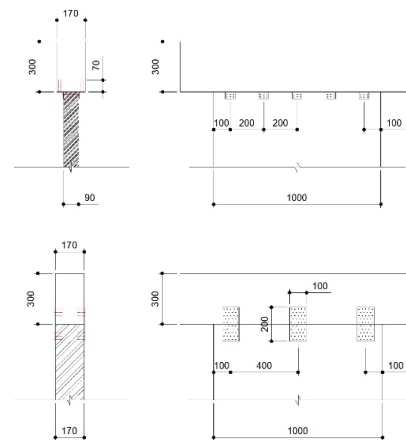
Details of upper connections (Up:CLT, Down:SIP)
